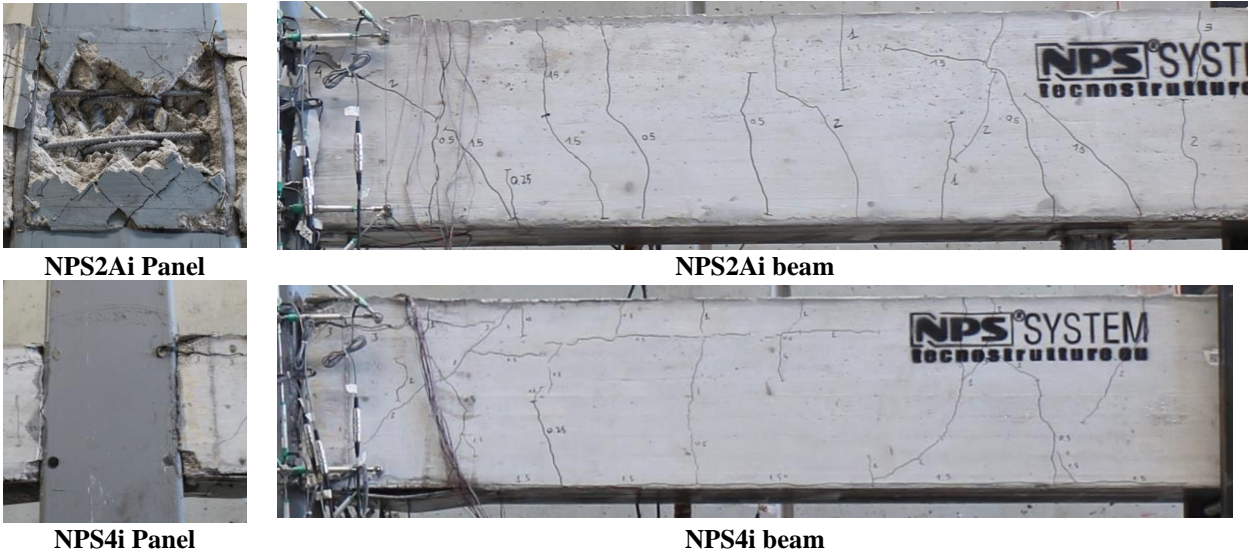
View of Beam and Joint Region of Specimens NPS2Ai and NPS4i at Failure
